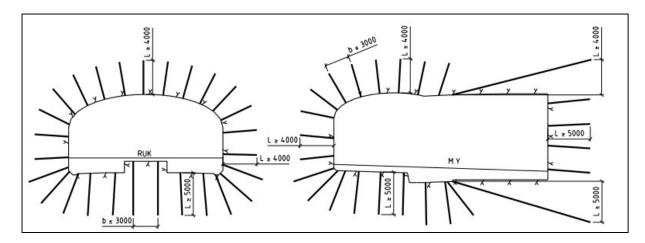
Borehole's length, overlap, and stick in specific grouting fan in case of connection to main tunnel.
